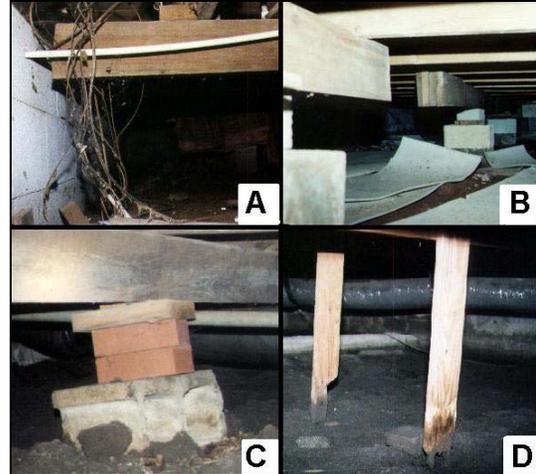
Pier and beam foundation problems not caused by wind: A) cantilevered beam, B) non-continuous beam, C) tilted pier, and D) rotted piers.
